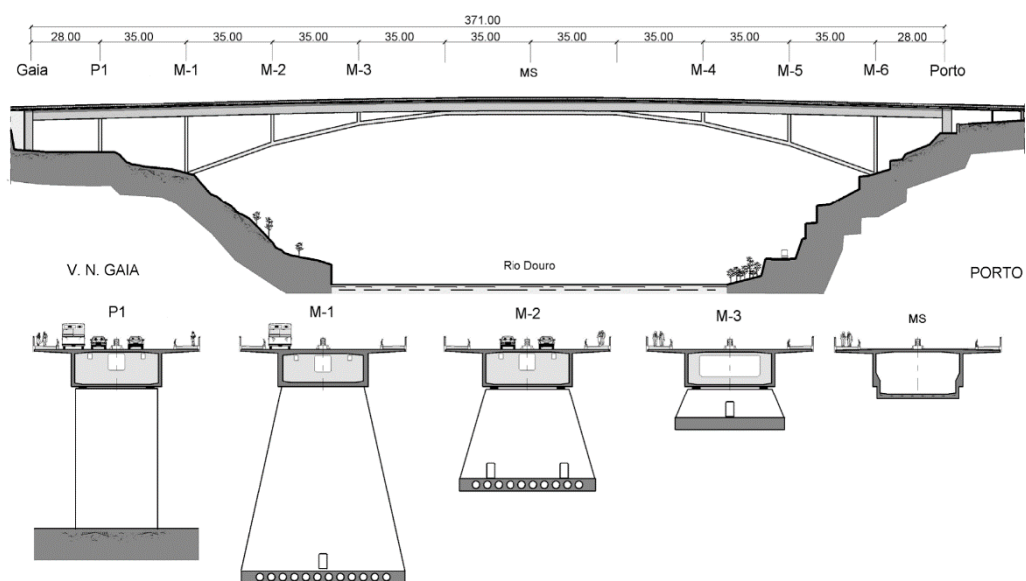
Elevation and cross-sections of the bridge (de Magalhães, F.M.R.L., 2010).
